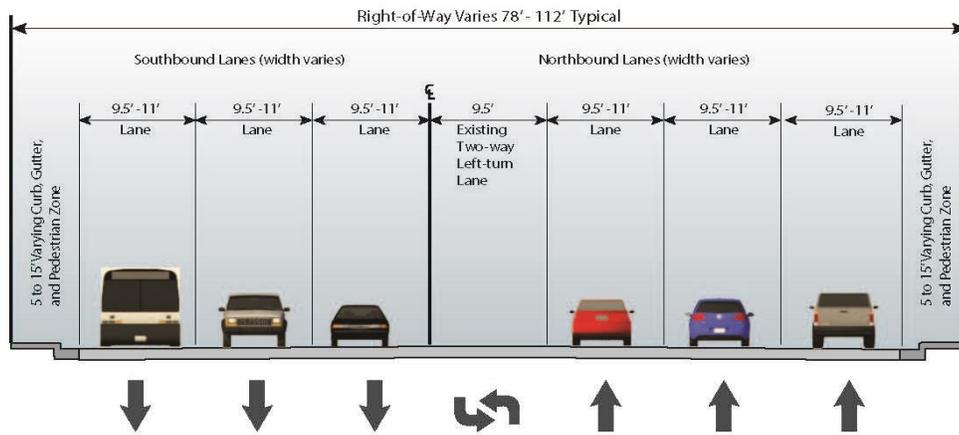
No-Action Alternative between West 10th Avenue and West Howard Place
